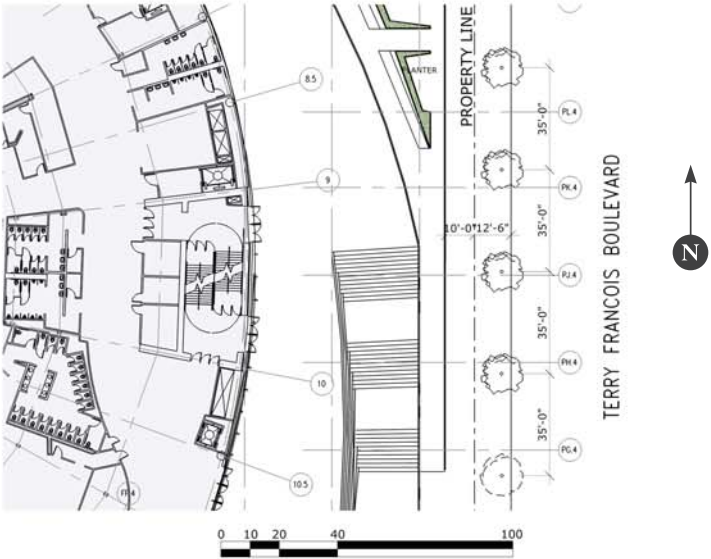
| TERRY A FRANCOIS BOULEVARD RETAIL 200 PLAN
